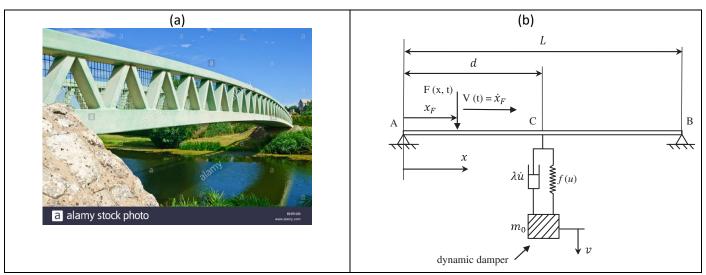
(a) single-span bridge, (b) beam model under a travelling load
